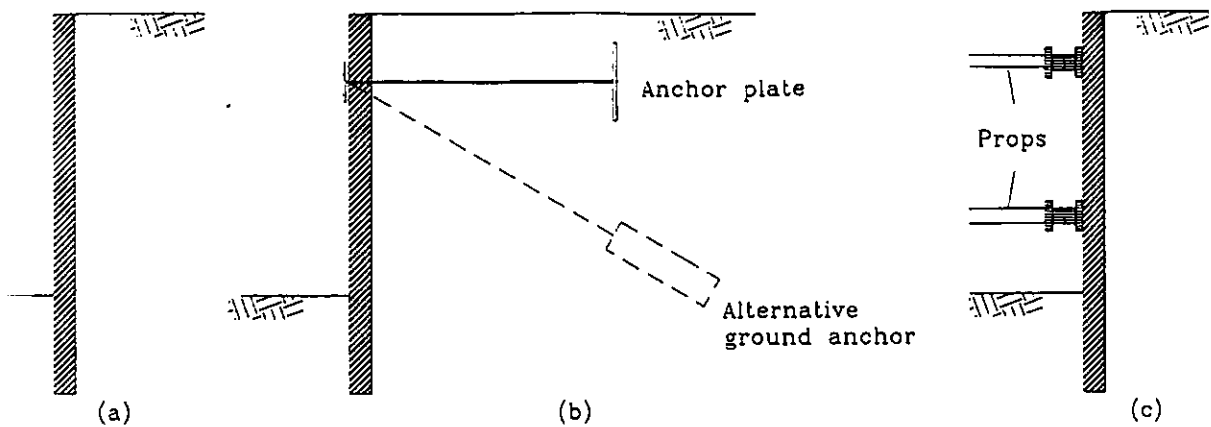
Types of sheet pile walls: (a) cantilever, (b) anchored, and (c) propped.
